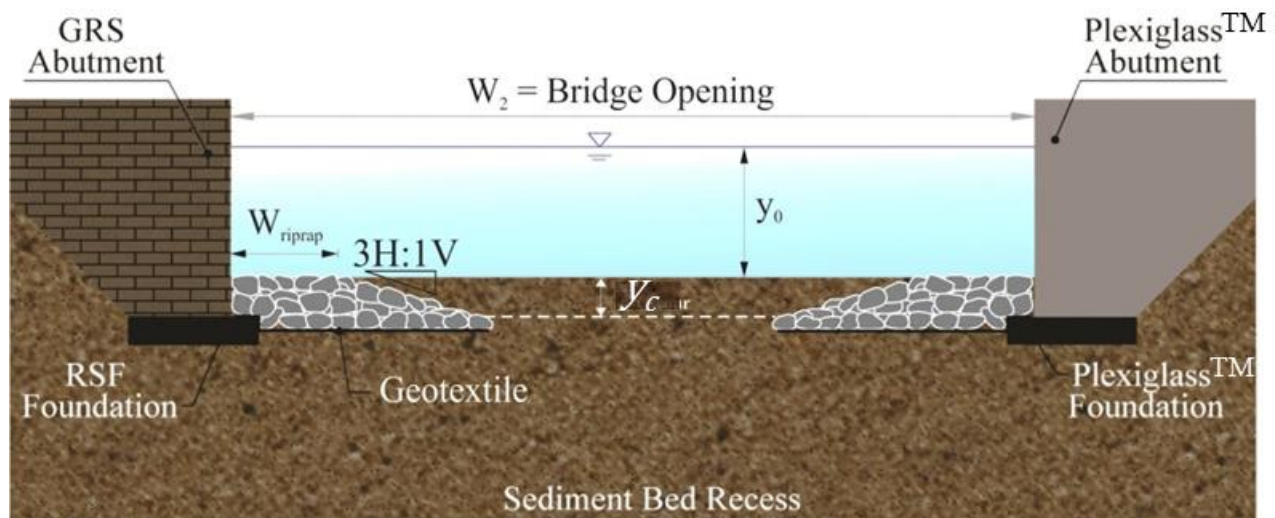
Sketch. Run 2 cross section—HEC-23 DG 18.
